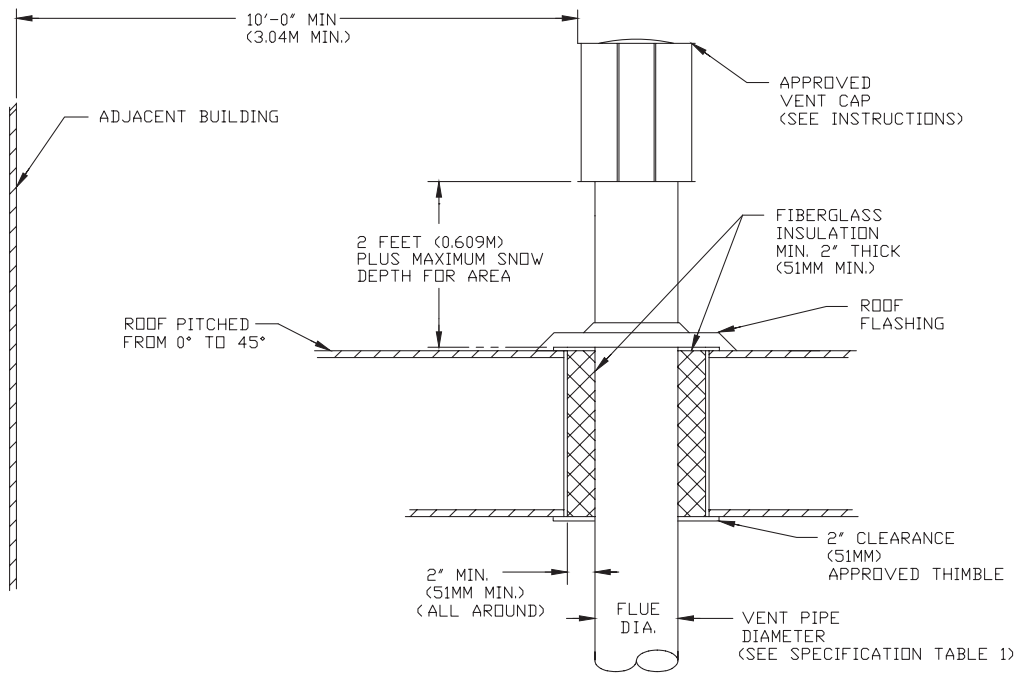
B – Vertical Arrangement – Single Wall Vent System to Single Wall Termination
